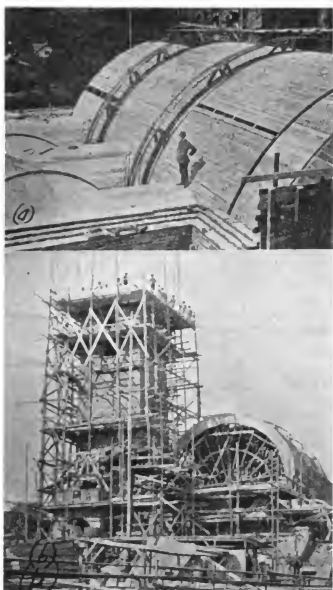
CENTERING IN PLACE (a) FOR BARREL ARCH ROOF OF A BAVARIAN CHURCH, AND (b) GENERAL VIEW DURING CONSTRUCTION.
